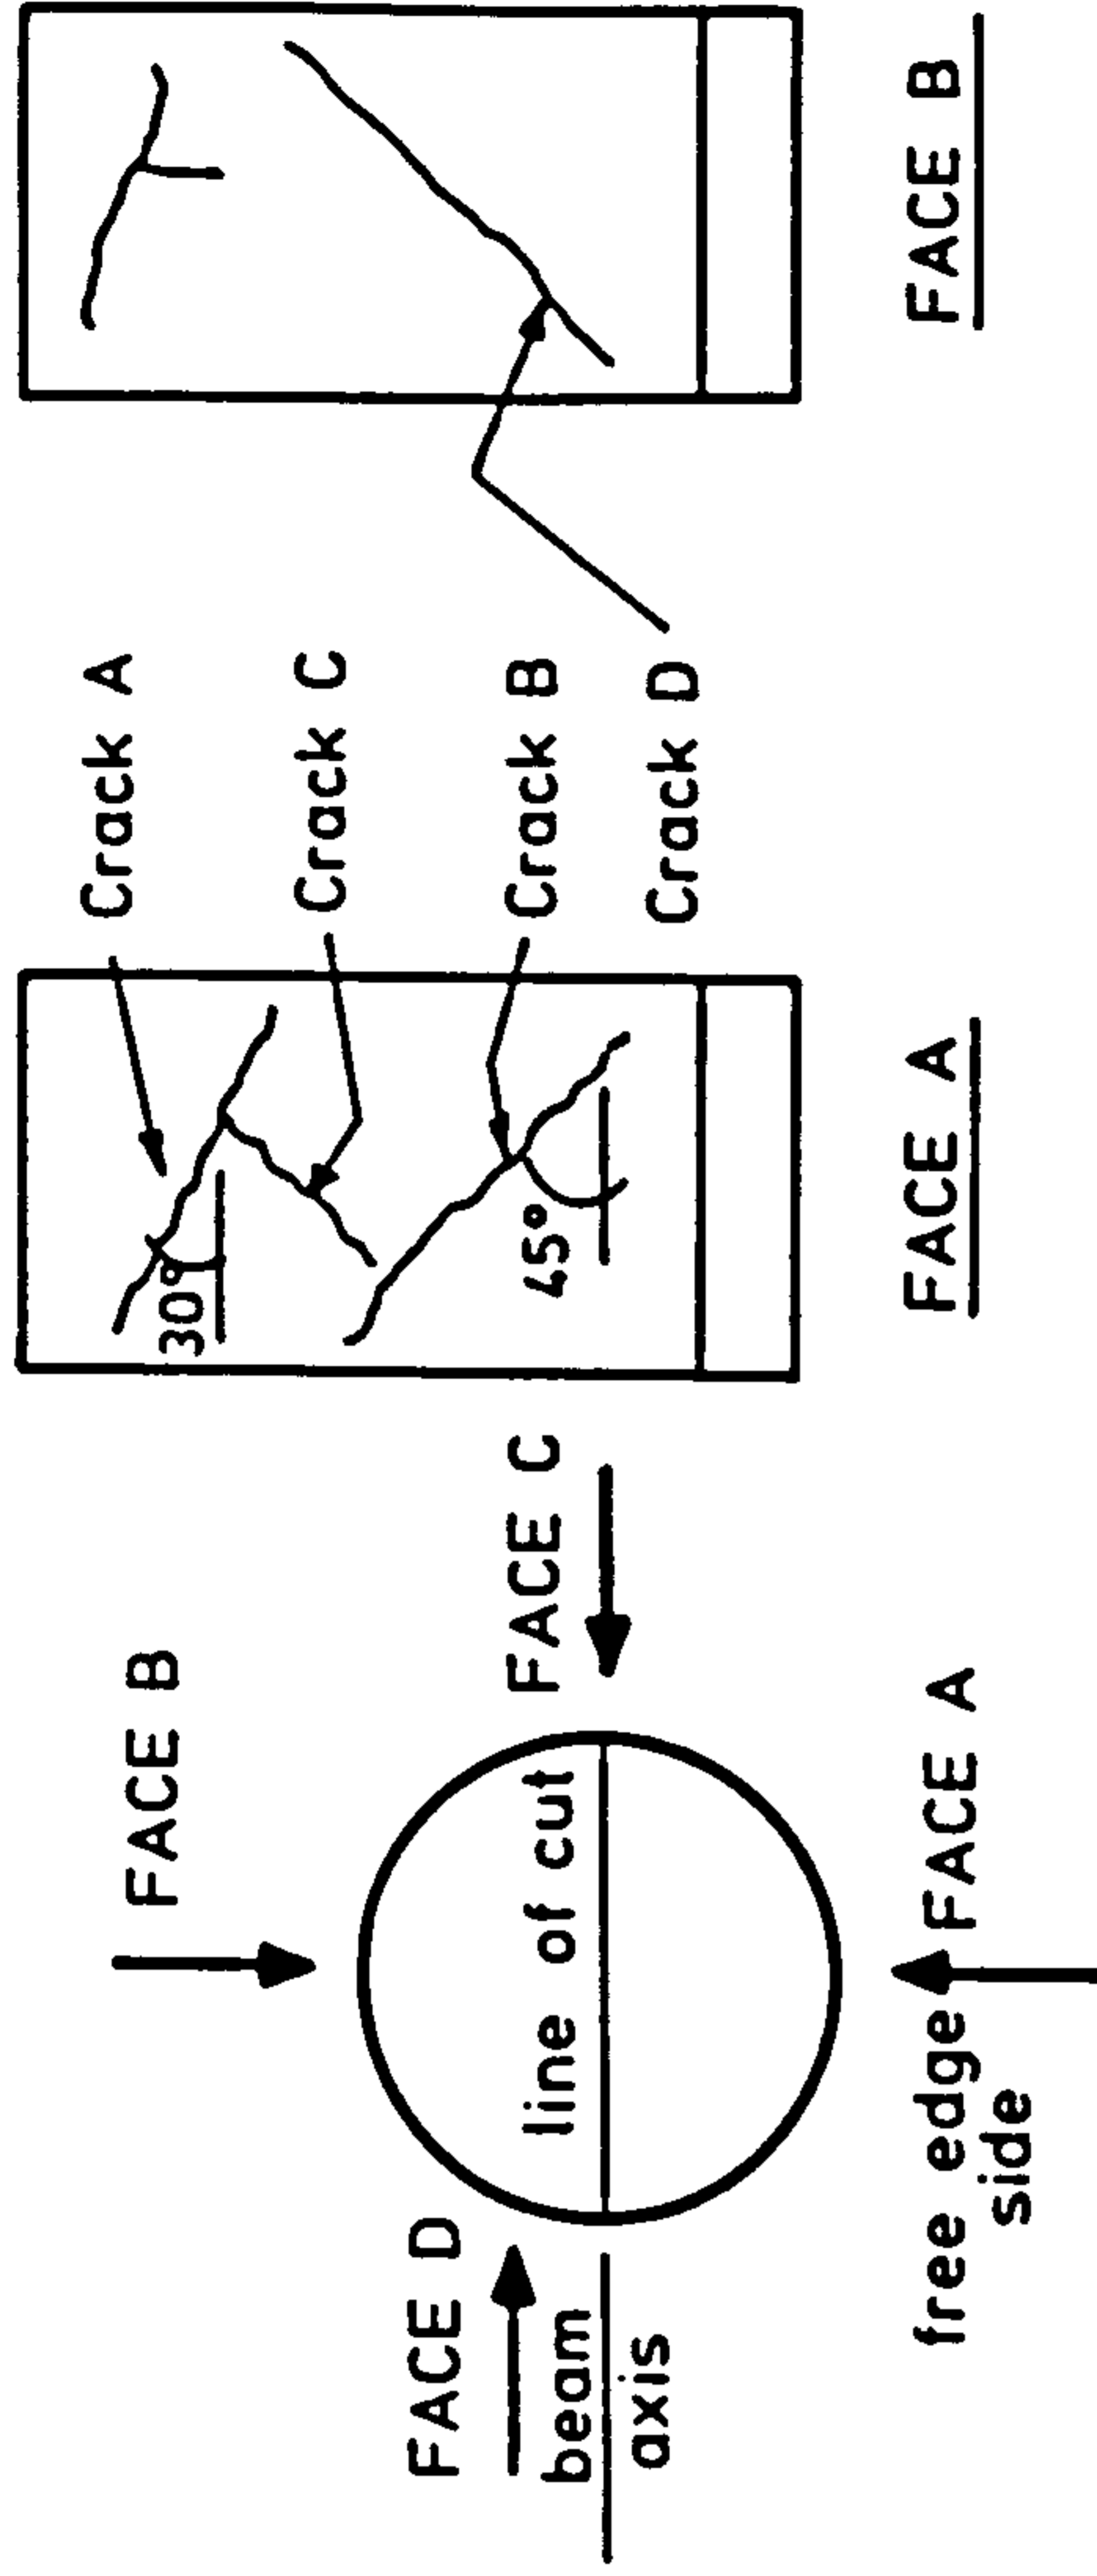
CORE 6 IN-SITU CONCRETE CRACK PATTERN
